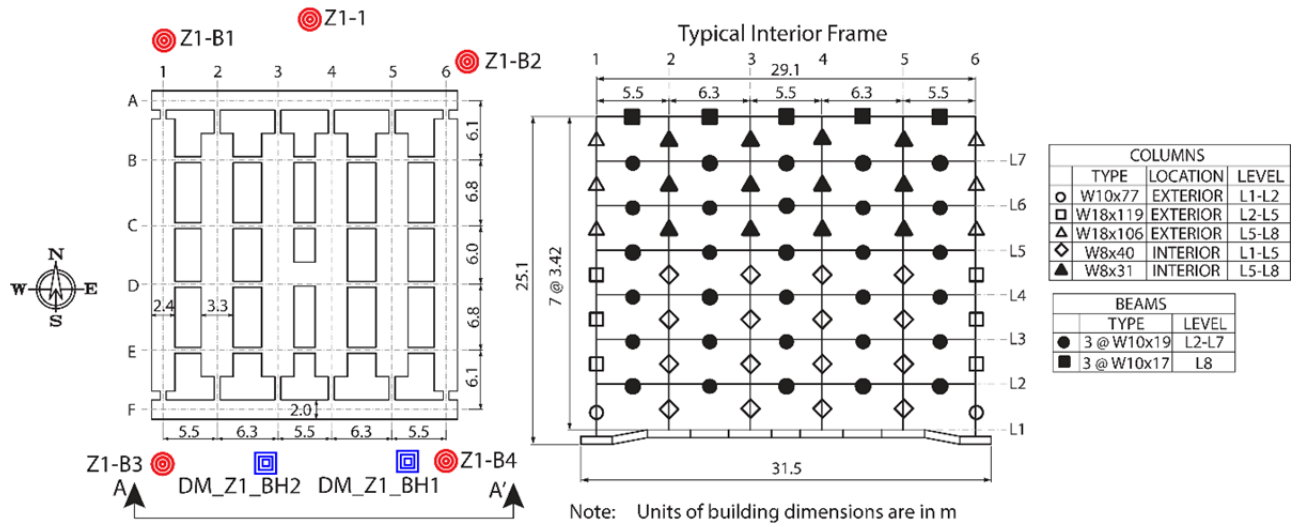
Foundation plan view of the FTG-7 building and elevation view of a typical interior frame in the EW direction.
